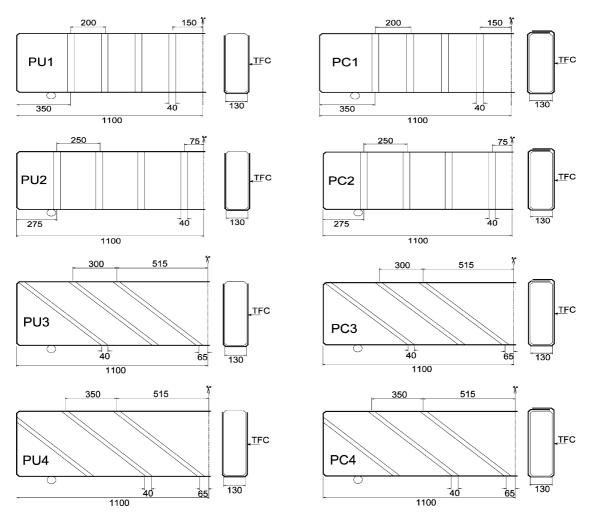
Configuration and details of the RC beams strengthened by bonding CFF strips.
